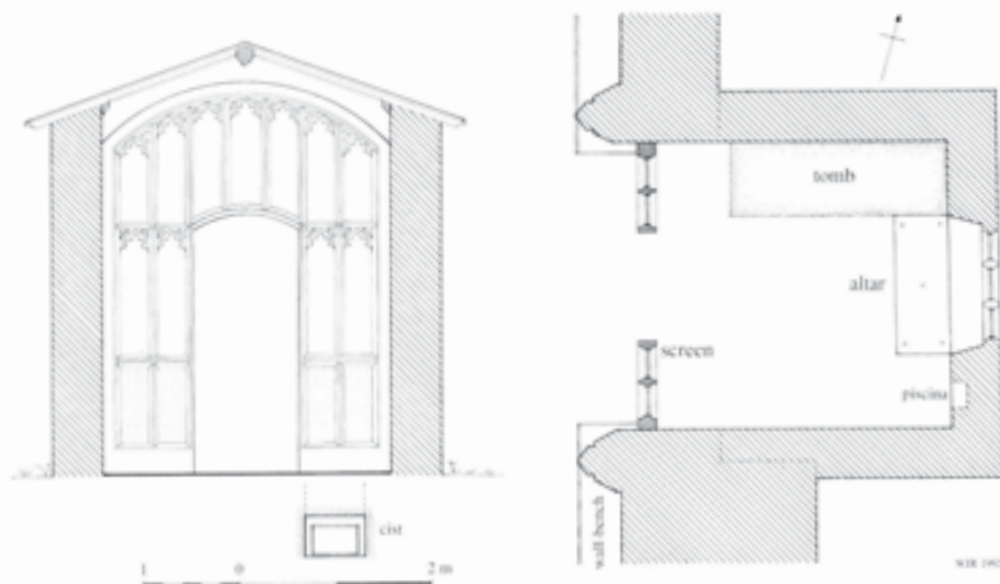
Reconstructed plan of the Holy Cross chapel, together with a suggested elevation of the traceried screen in the west wall. Scale 1:80
